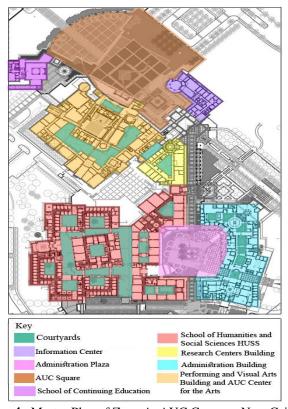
Master Plan of Zone A, AUC Campus, New Cairo
